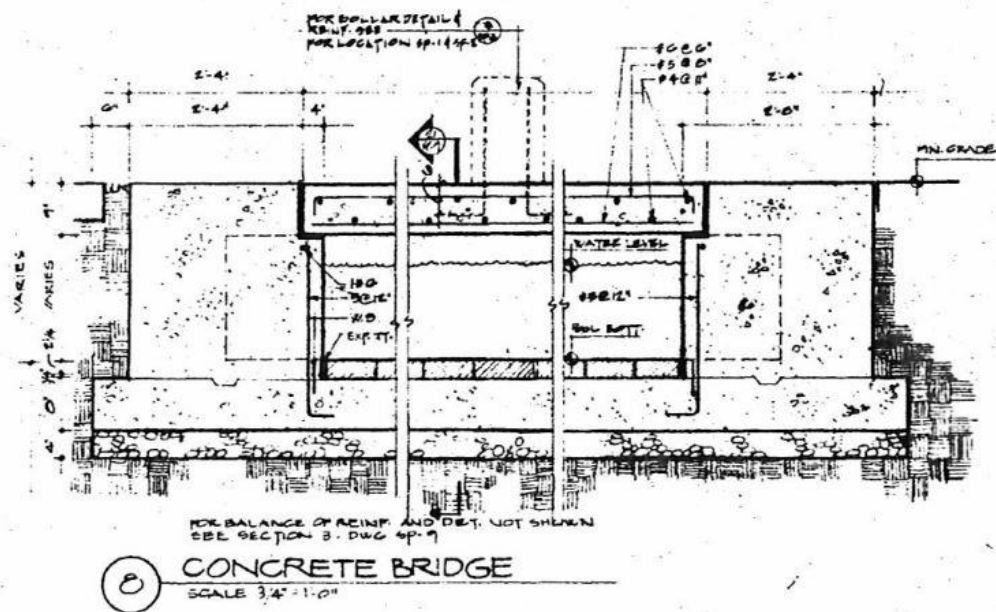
Original detail for reinforced concrete bridge, Detail 8, SP-9 in Appendix A
